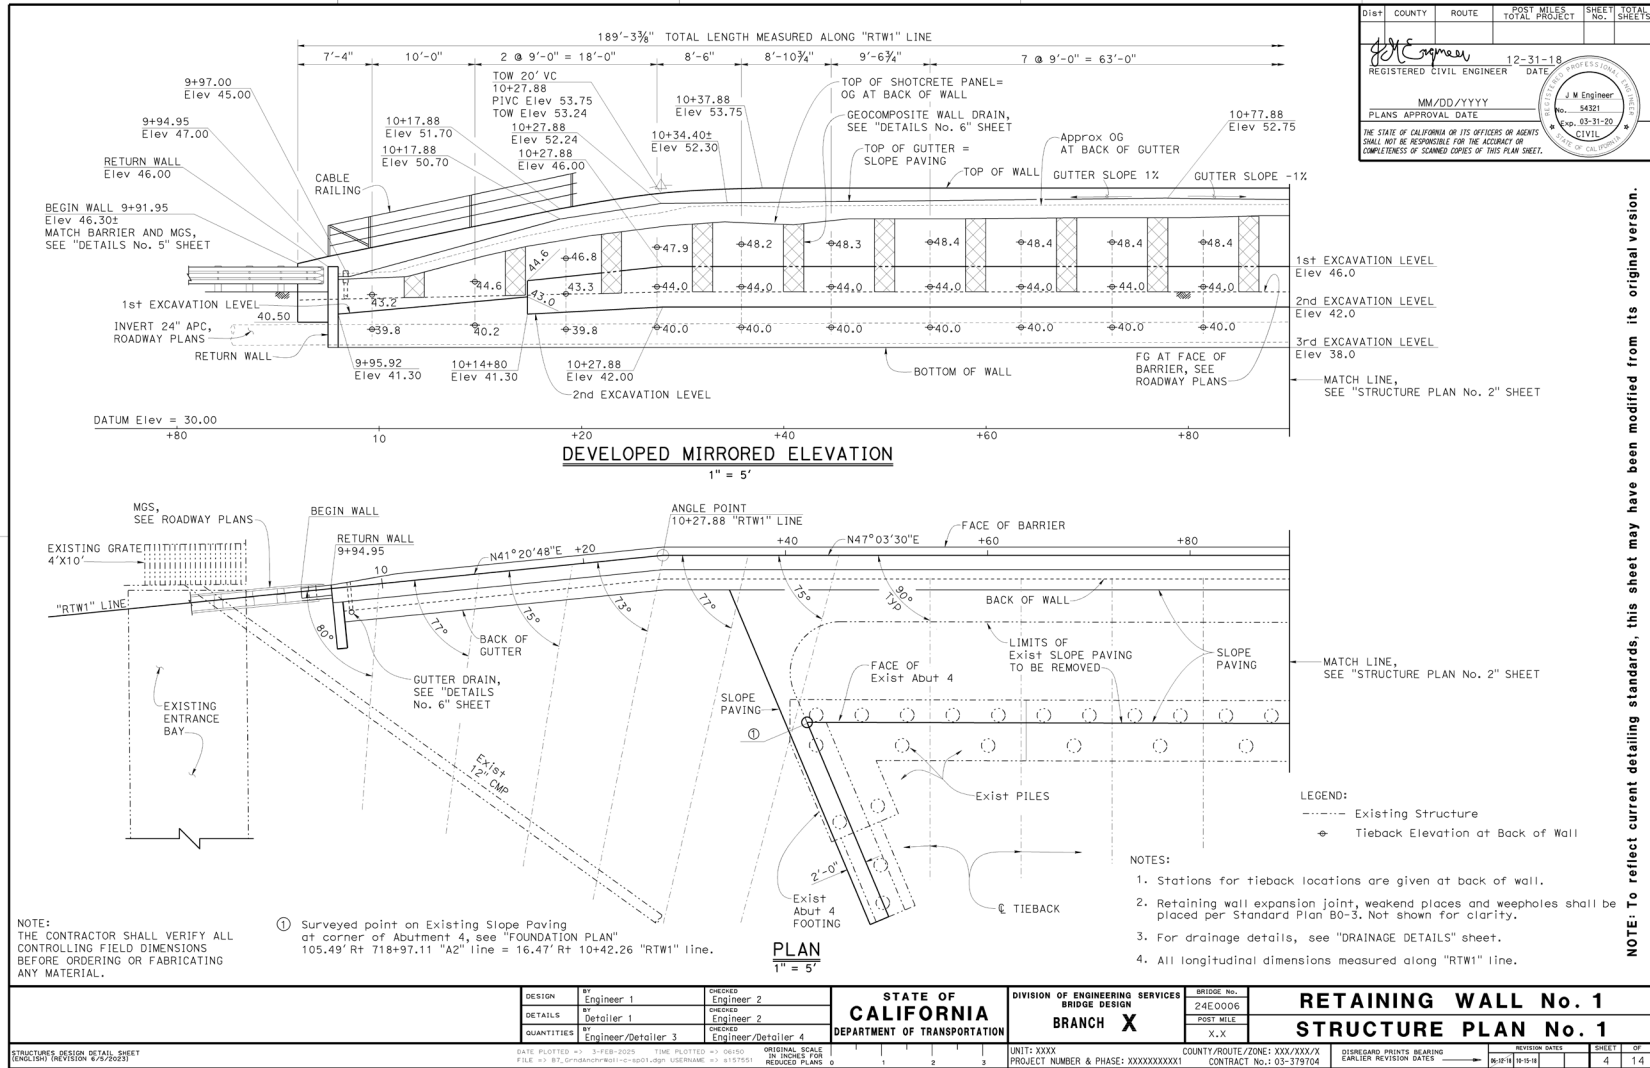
A.C.7 Ground Anchor Wall Detailing Example
